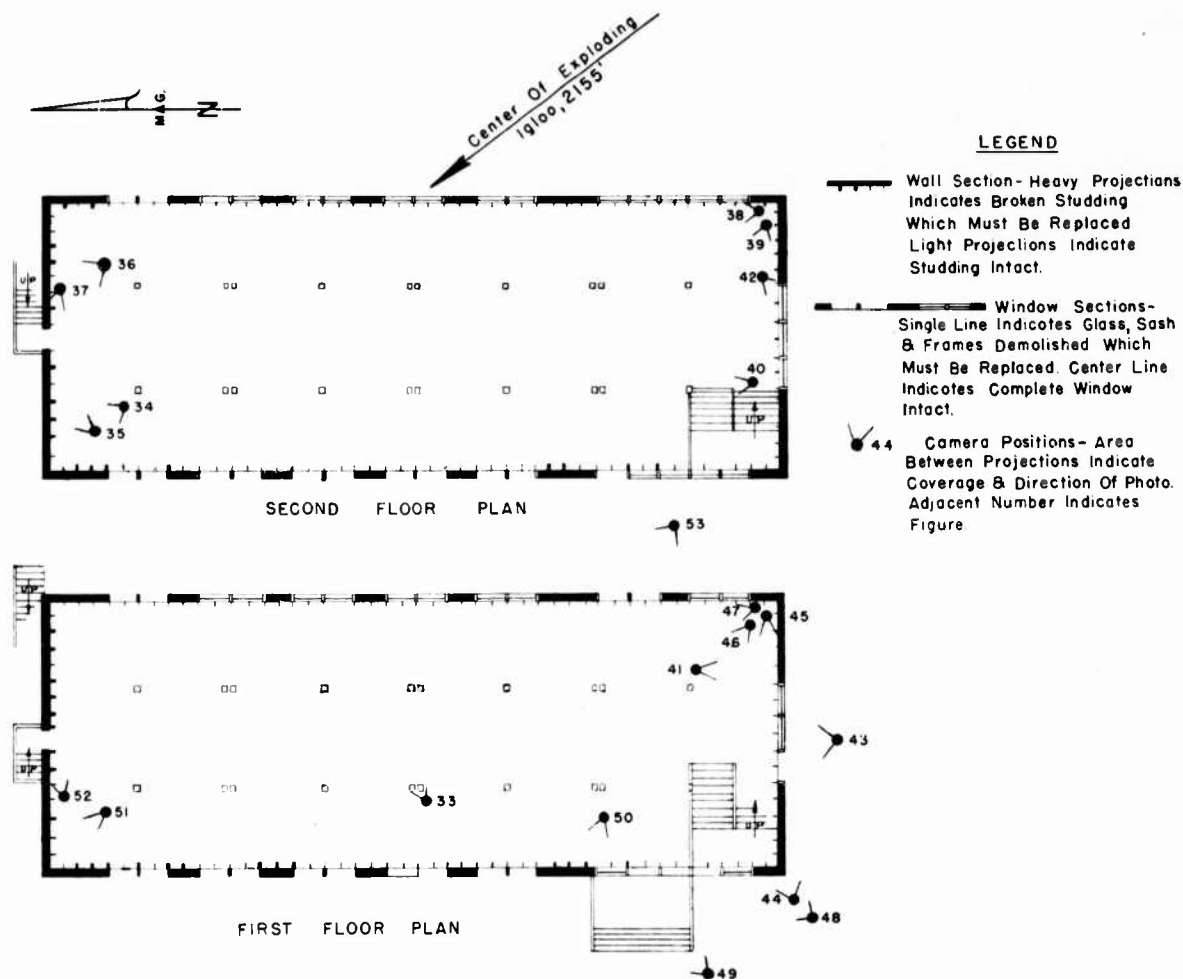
Barracks building damage. Legend to photos, Test 1.
